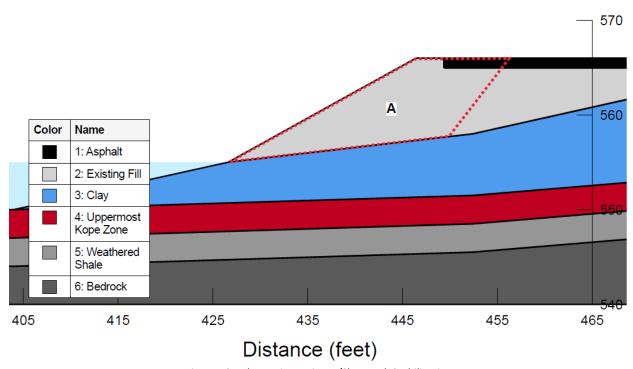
Alternative 1 Riprap/Shot Rock Stabilization
